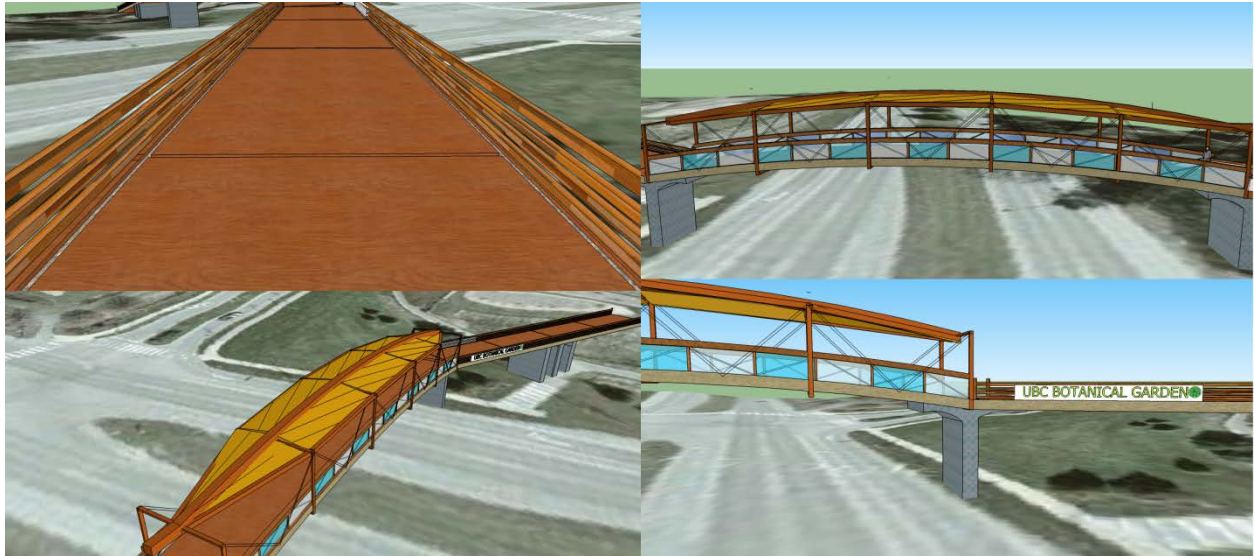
Top Left Ramp Drainage, Bottom Left Leaf Shape Roof, Top Right Arch Deck and Arch Roof, Bottom Right UBCBG Logo
